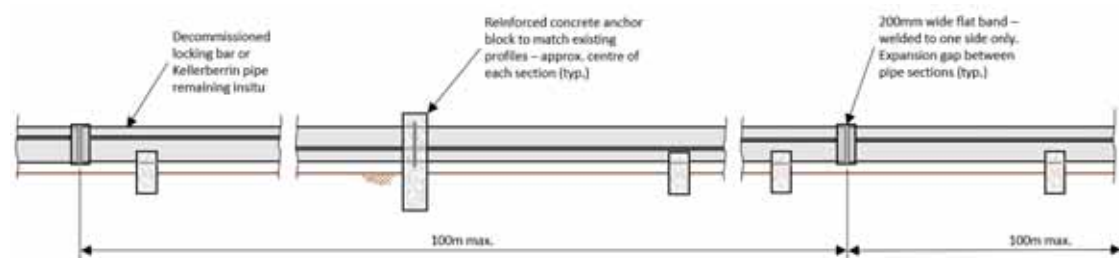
Proposed 100m insitu length interpretive display section of locking bar pipeline
